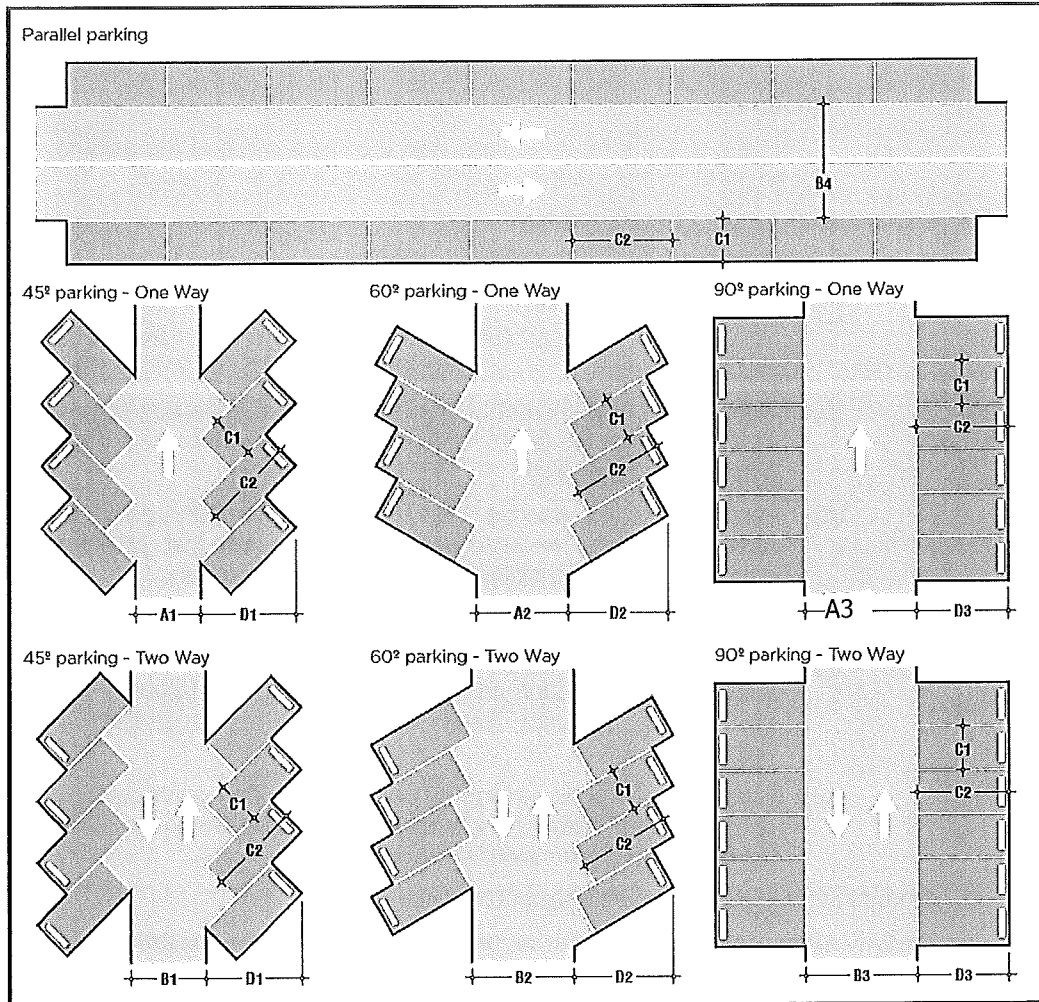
Parking Lot Stall, Aisle and Parking Bay Dimensions
